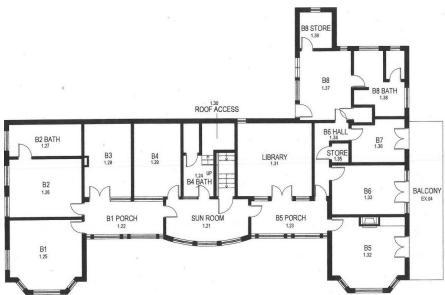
First Floor Plan of the Earnscleugh House, showing the Space/Room Numbers for identification.
